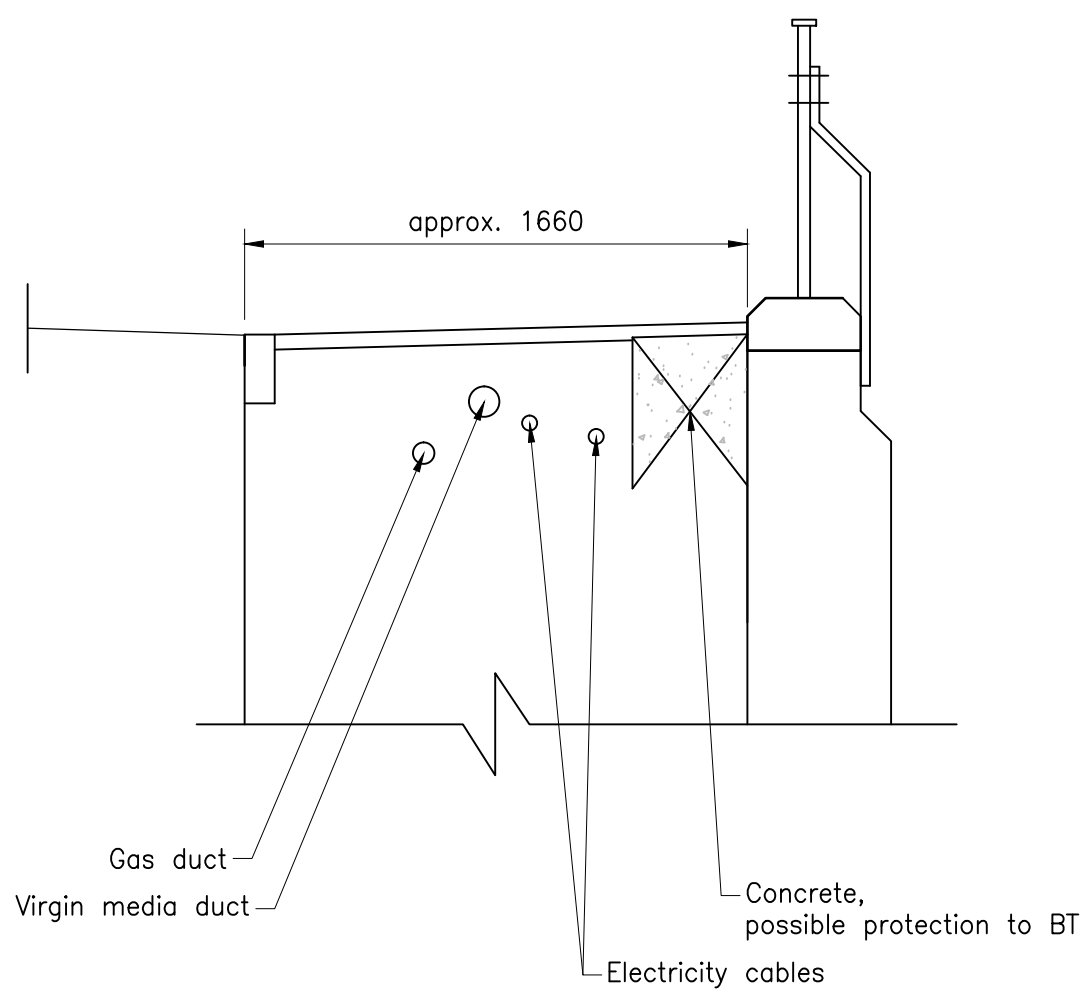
DETAIL Y - TYPICAL FOOTWAY TRANSITION DETAIL
